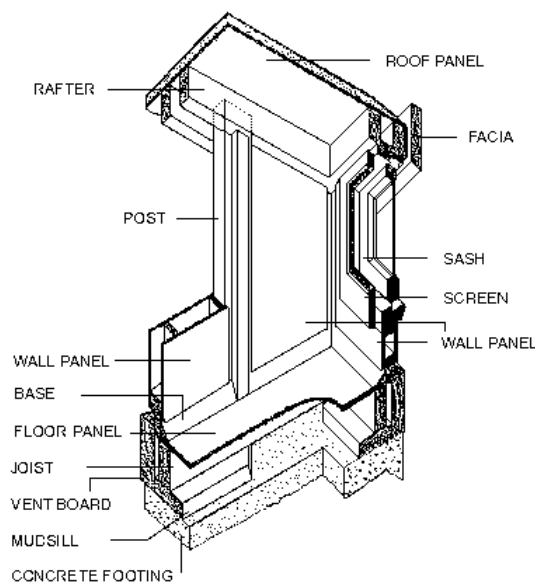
Cross-section of a typical panel and post connection redrawn by the author (Garland no. 2581)
